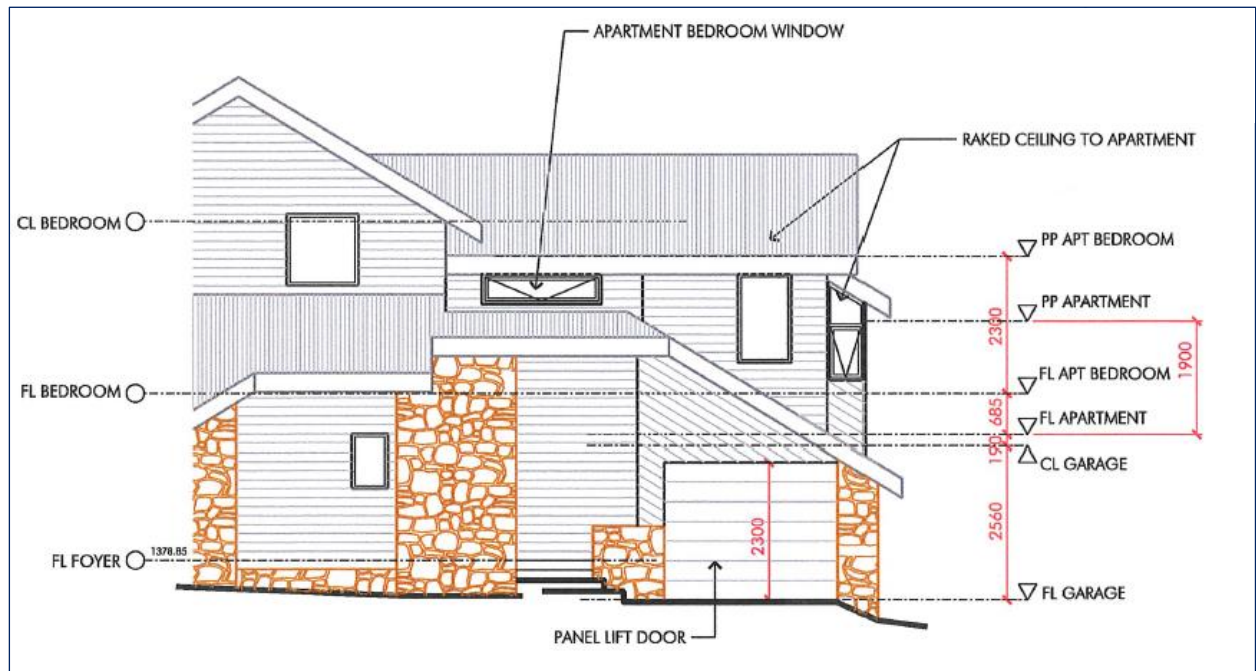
| Proposed southern elevation (Source: Applicant's documentation)
